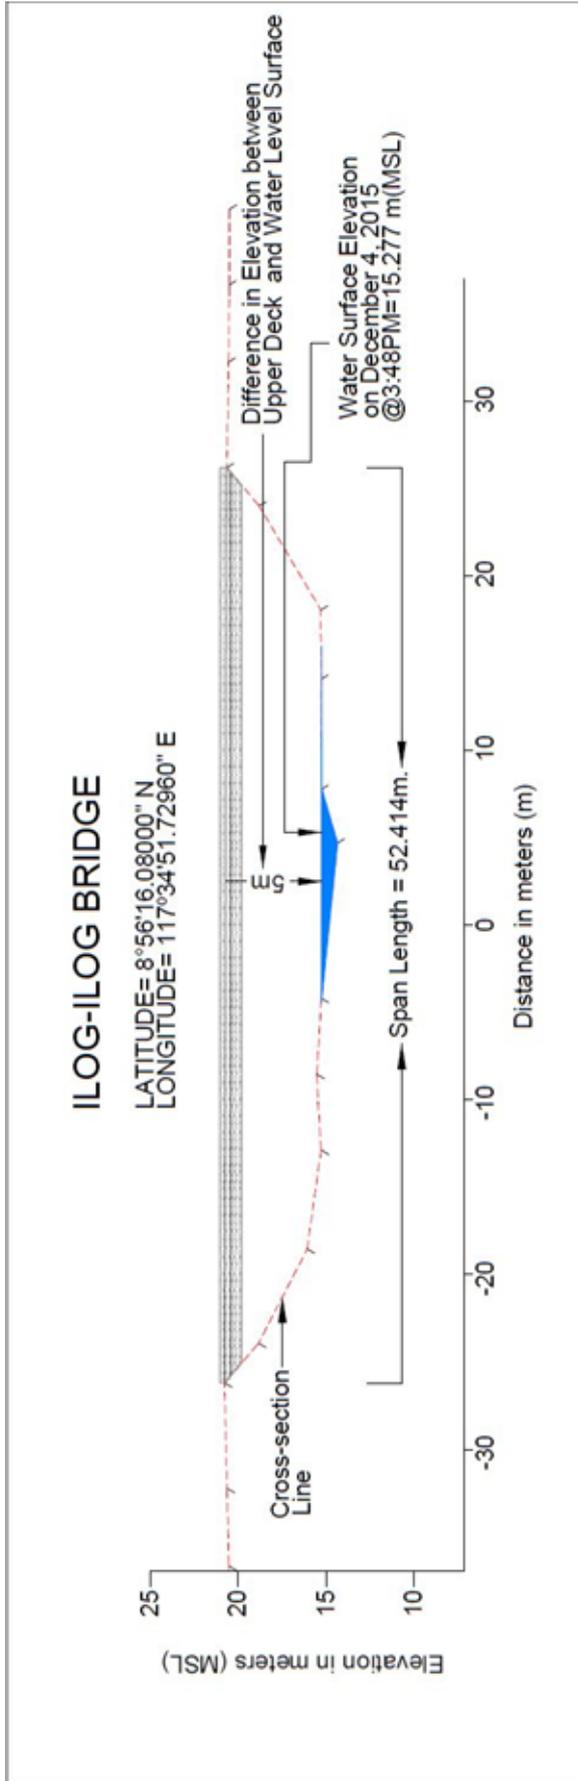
Ilog-Ilog Bridge Cross-section Diagram.
